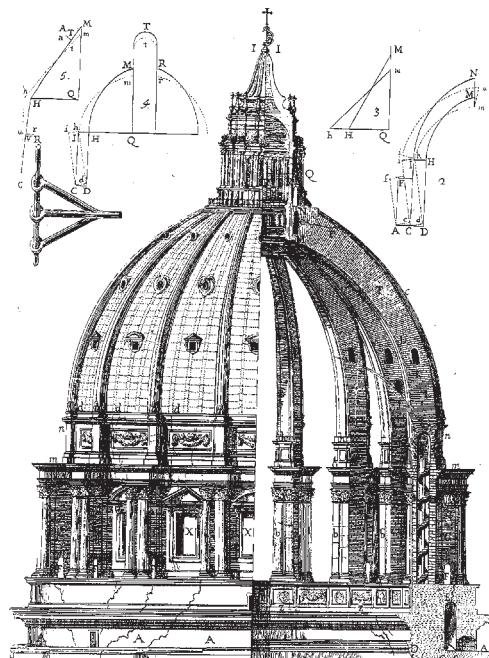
Detailed record of cracks in the dome. The drawings on top depict the notion that cracks were caused by the horizontal movement of the abutments.
